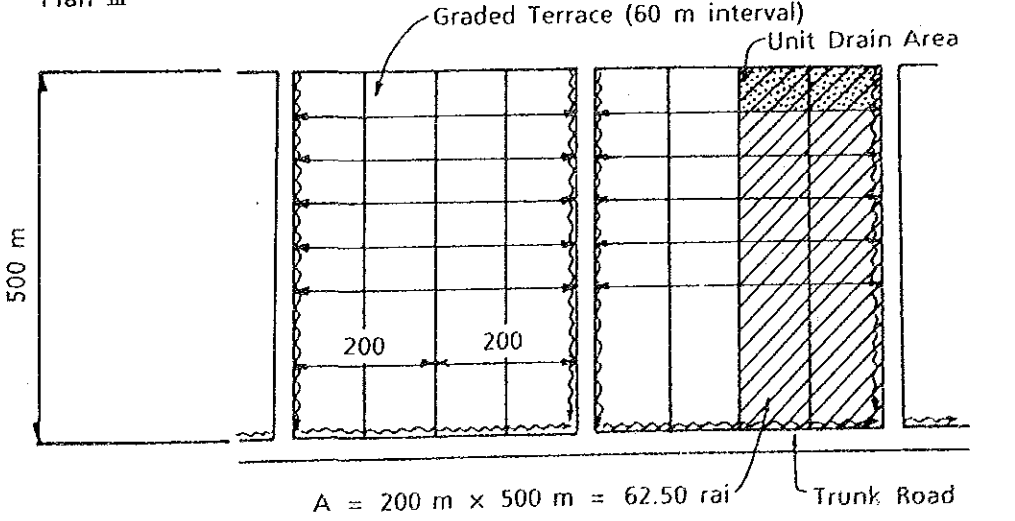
Farm Road, Drainage and Terrace Arrangement
